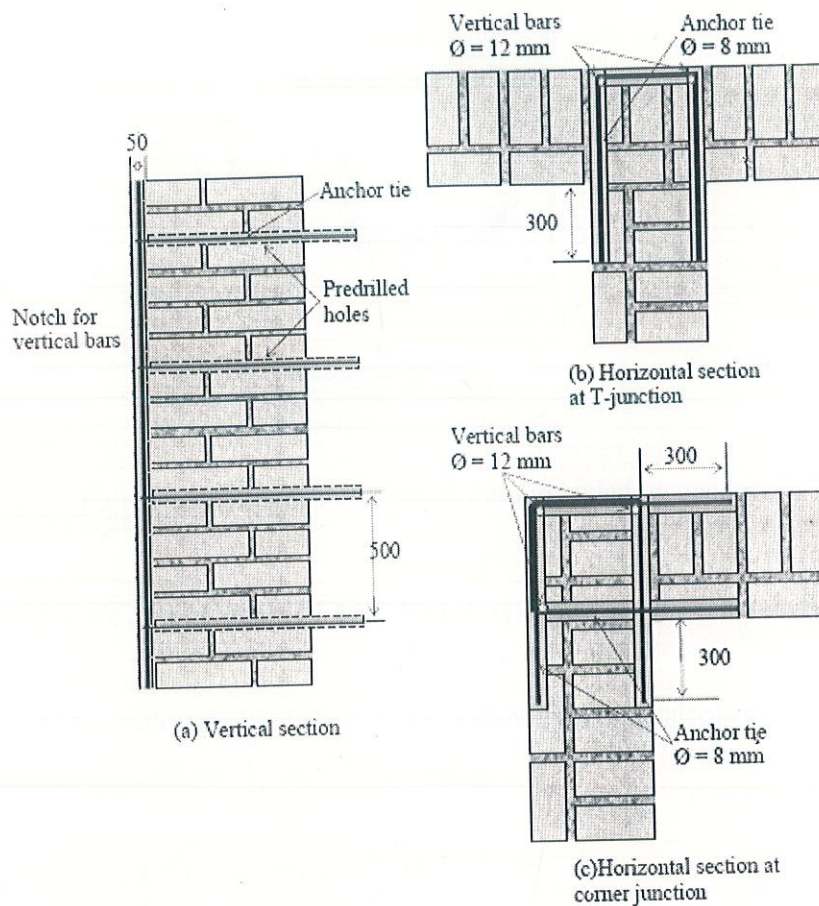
Insertion of dowel bars at corners and T-junctions (dimensions in mm)
